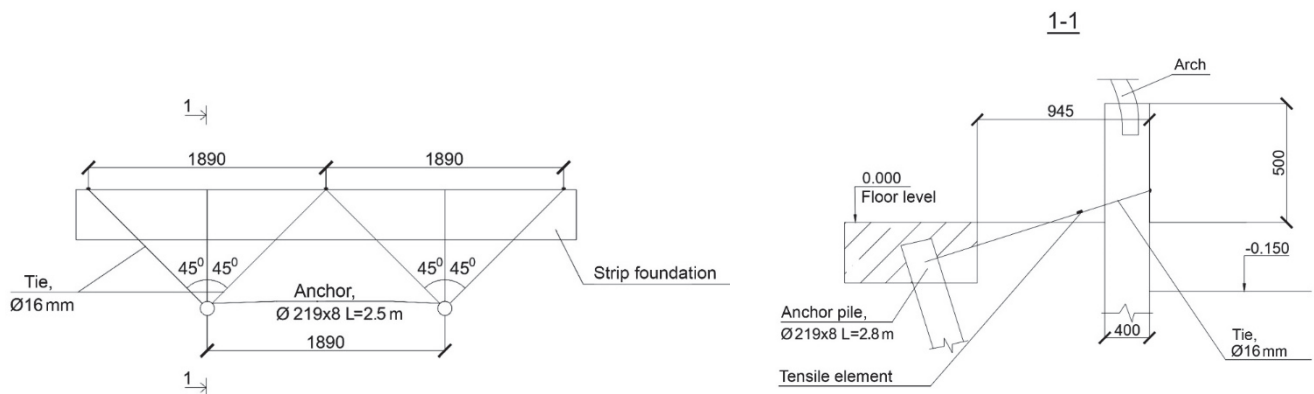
Method 1. Installation of tie-beams in the strip foundation of an arched building with steel pile anchors
